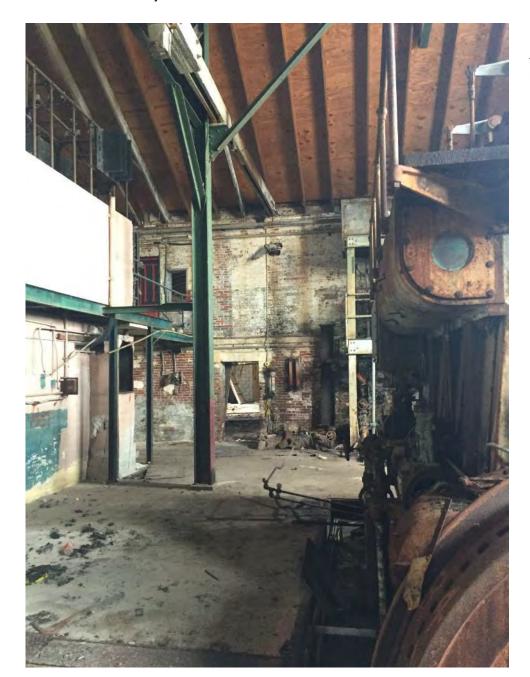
Interior of buildings at the Site showing an inactive generator
